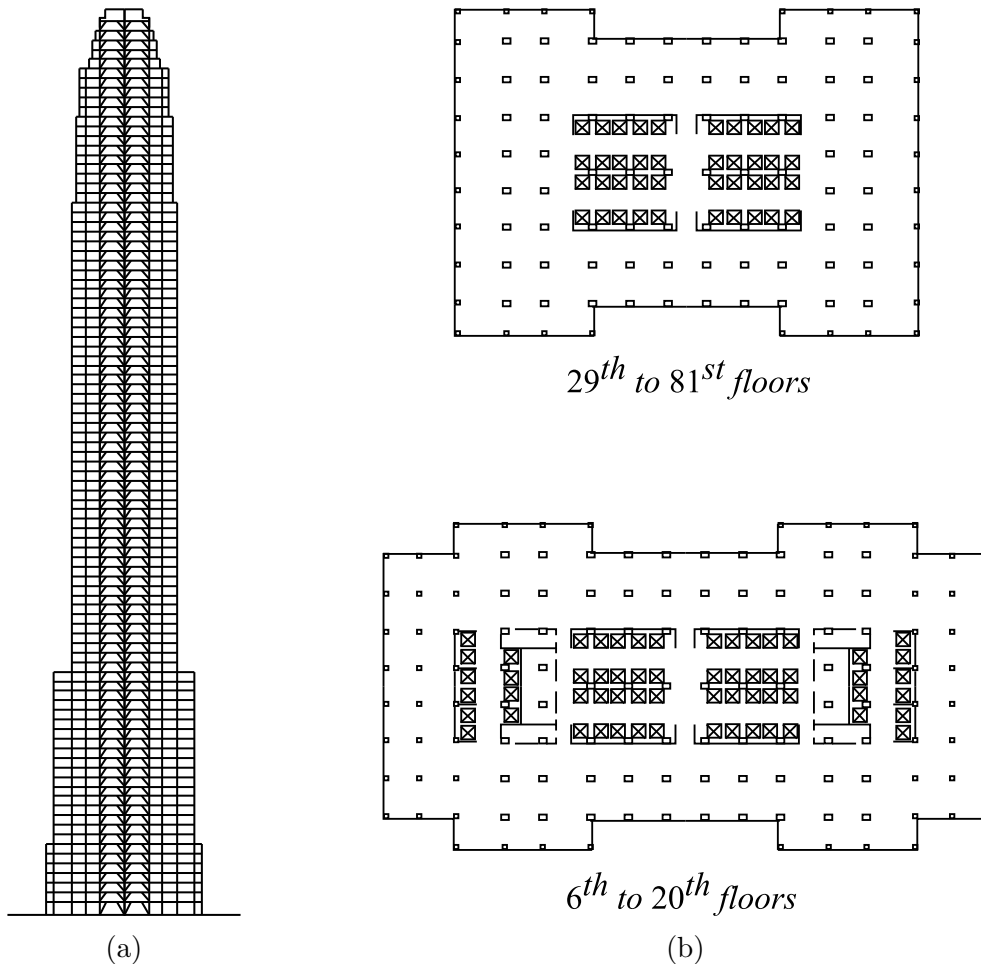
Empire State Building. (a) Vertical section; (b) Floor plans
